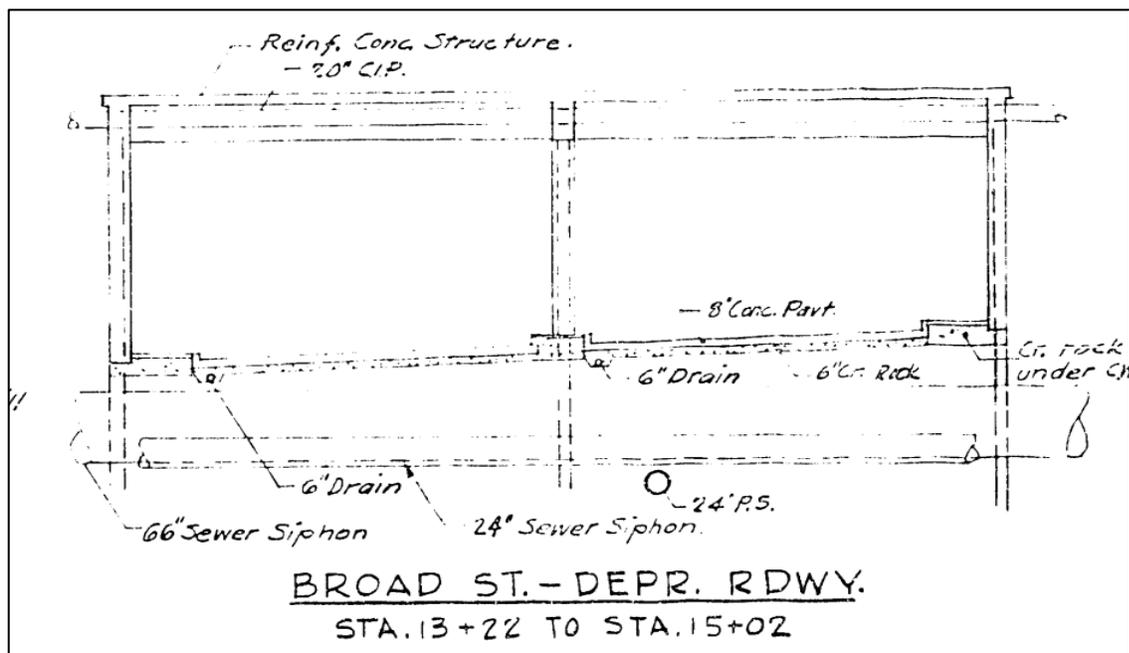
Section of existing structure for the bridge at the intersection of Mercer Street/Dexter Avenue North over Broad Street.
